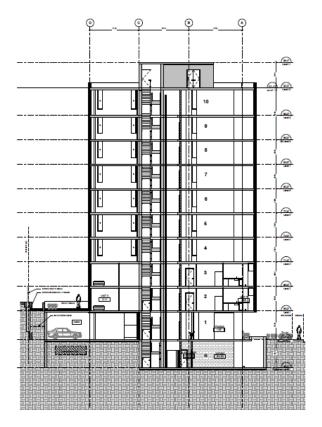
Section through the proposed tower illustrating its relationship to 149 Daly Avenue (left) and 251 Besserer (right). Note the enclosure of the ground floor parking at the rear of the property proposed outdoor amenity use above the ground floor parking. Source: Hobin Architecture 2019.
